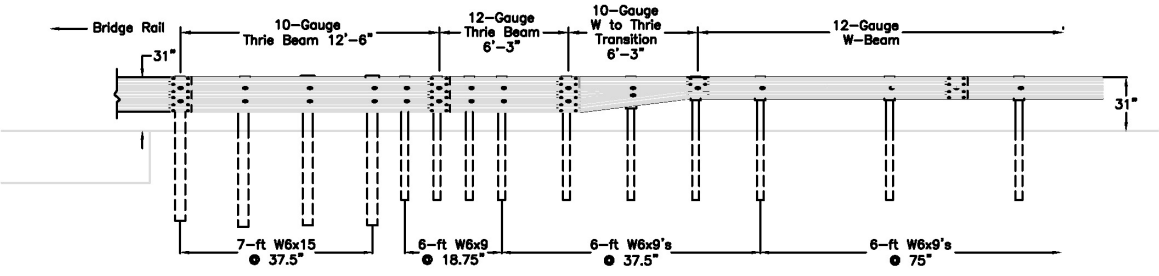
Attachment to Nebraska Transition to Vertical Face Concrete Parapet [34-35]
